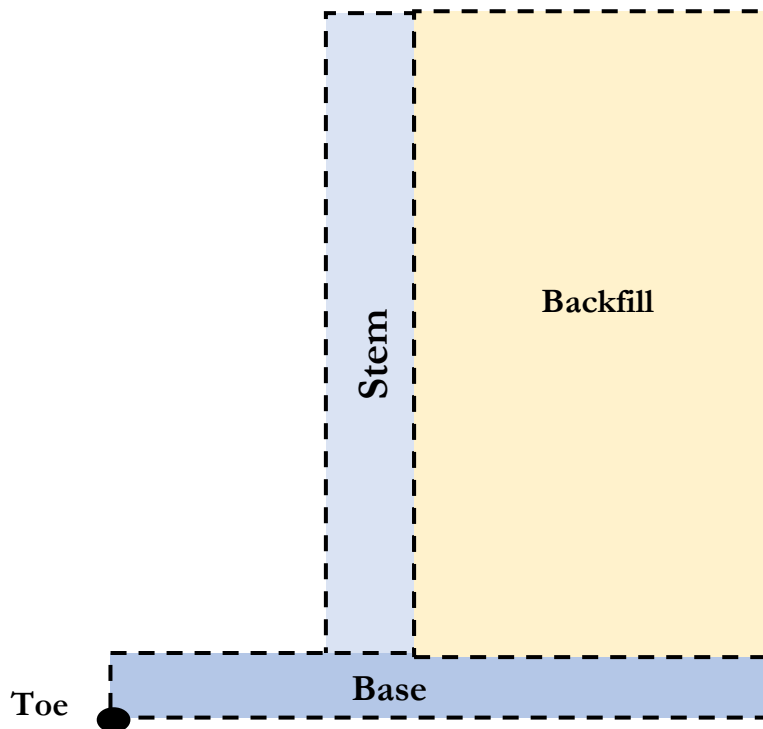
Division of the retaining wall into subsections for the calculation of internal forces and the center of gravity.
